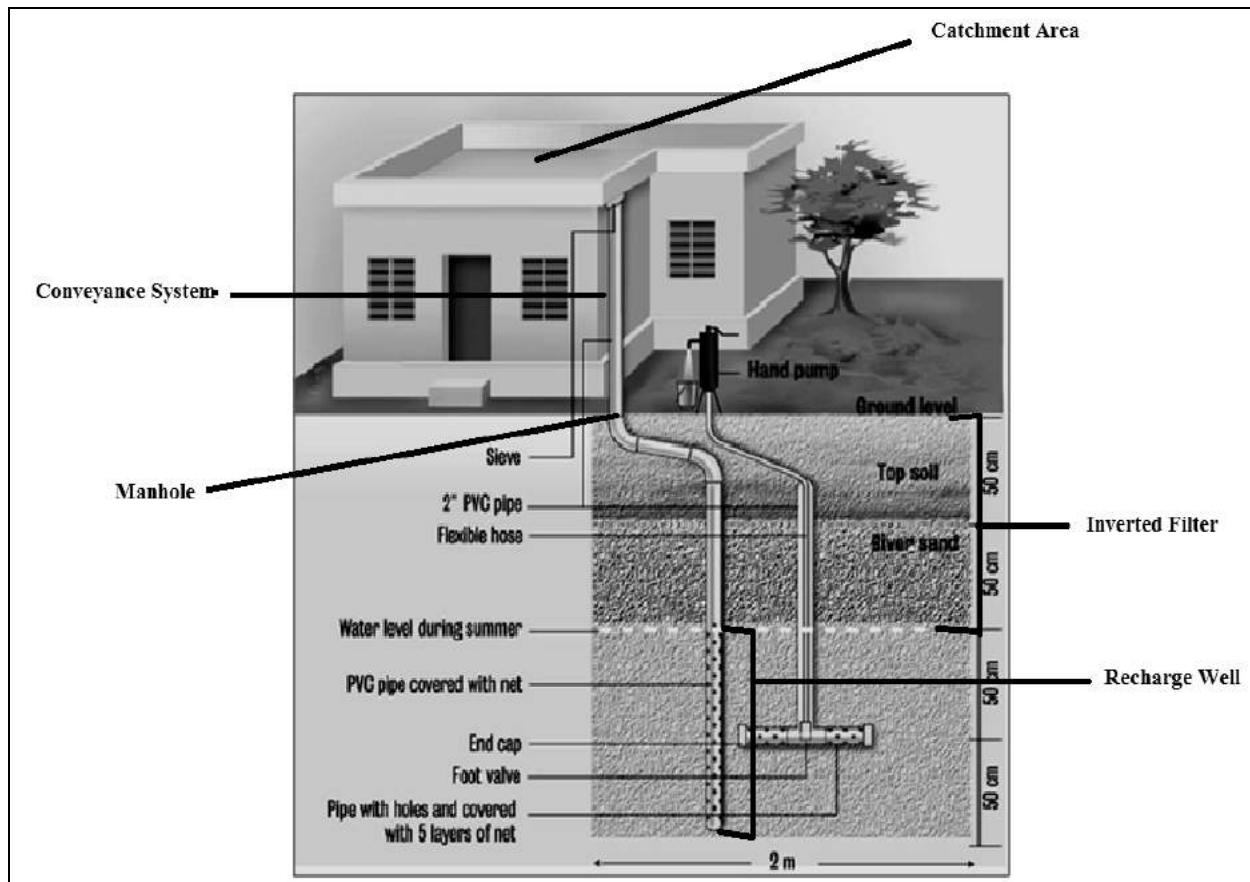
Roof Top Rain Water Harvesting and Recharge to Ground Water
